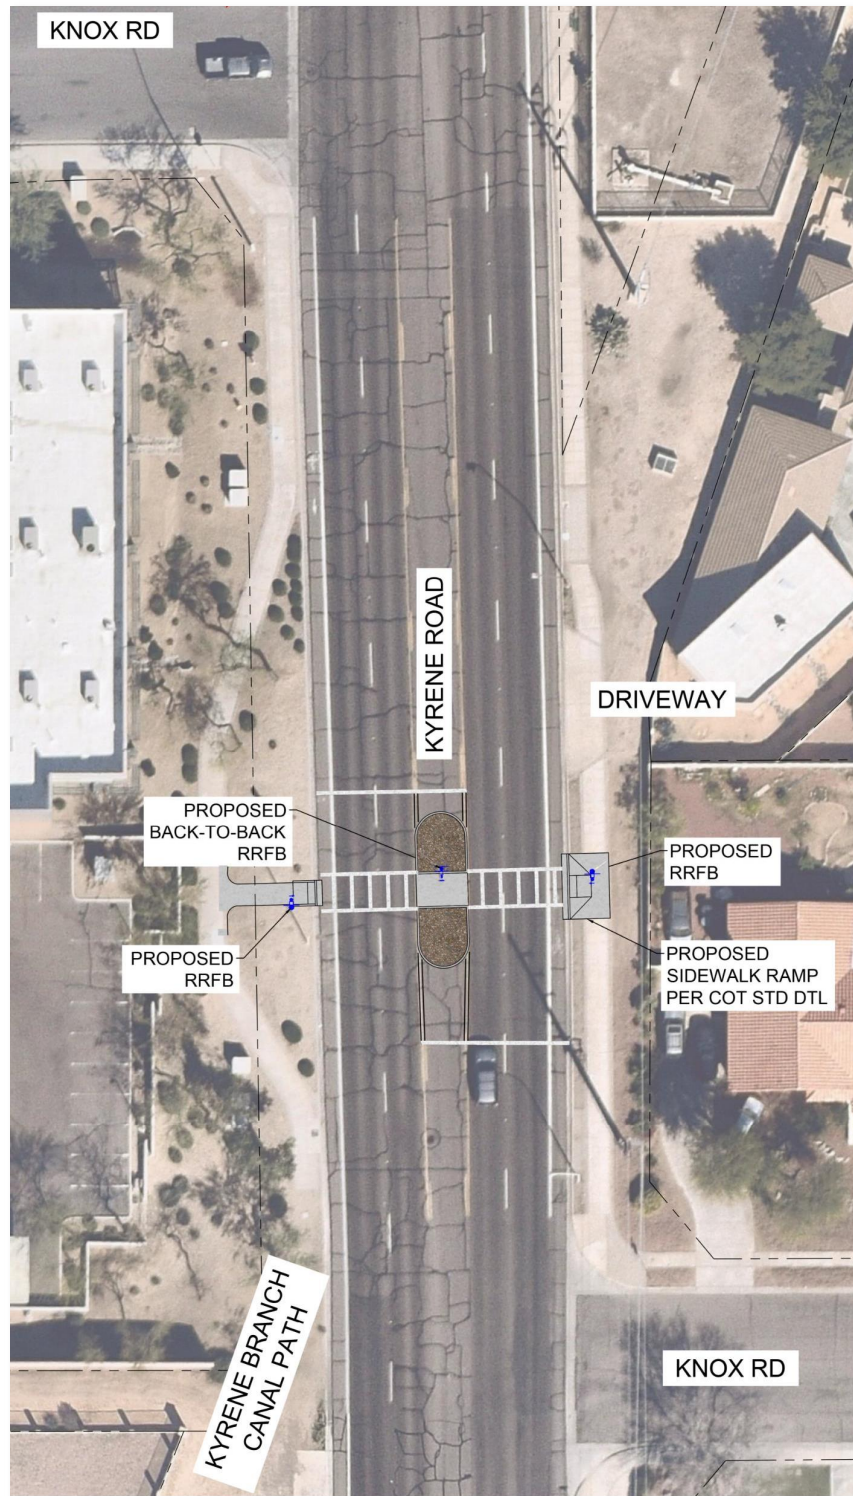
Proposed Rectangular Rapid-Flashing Beacon (RRFB) - Segment K1 - Option D
